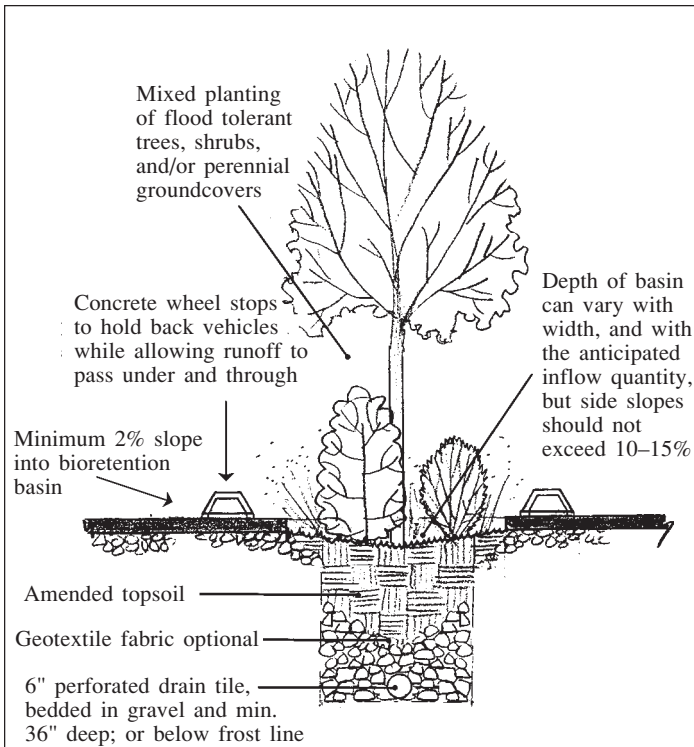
Cross section of a parking lot "wetland island" for bioretention, with an 8-foot width.
